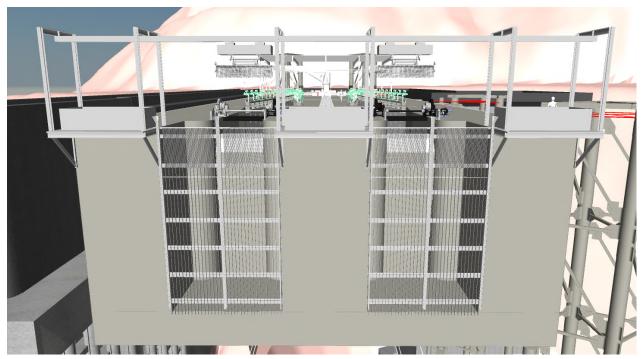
Front Elevation View of Trashrack and Rake Assemblies
